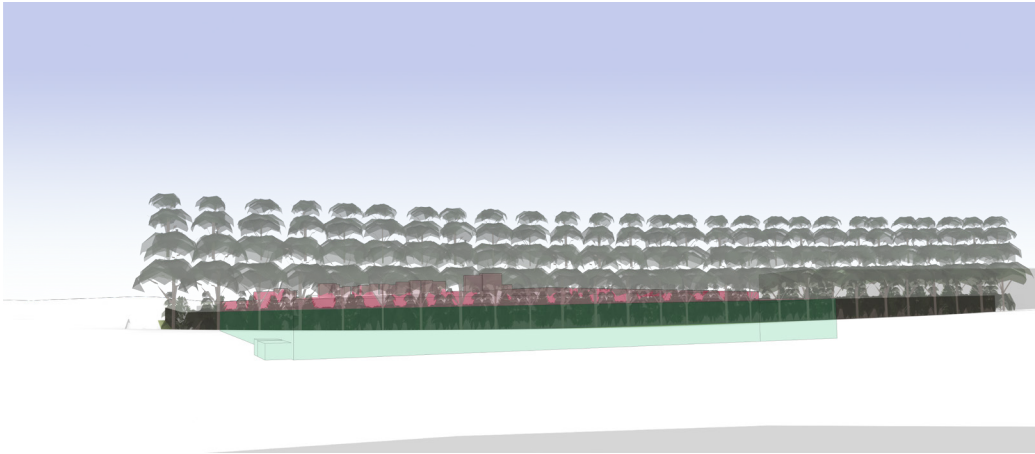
View 04 - Buildings with proposed plant and proposed boundary trees and low level shrubs
